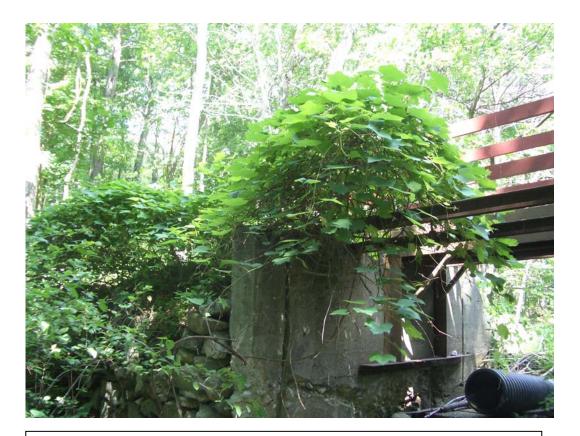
Downstream of spillway facing the right (west) spillway wall and dam wall with grape vine
